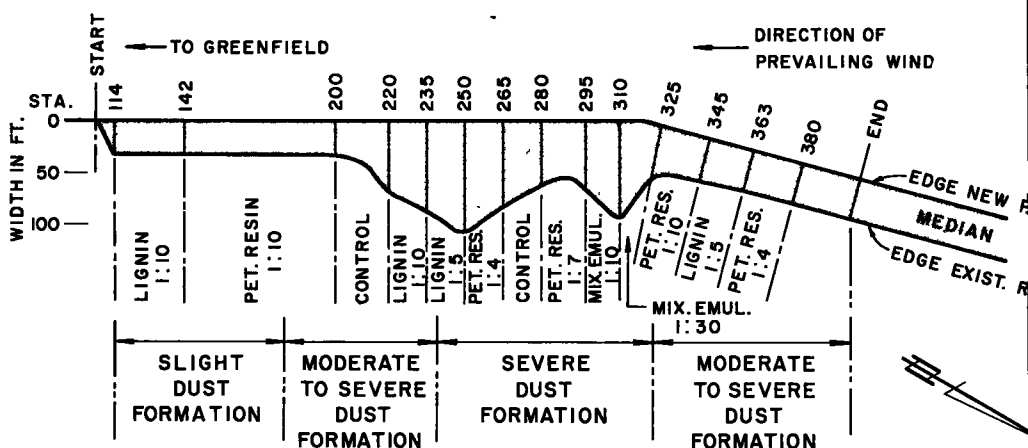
Dust control test sections—road V-Mon-2-D test sections laid on Aug. 12, and 14, 1957.
